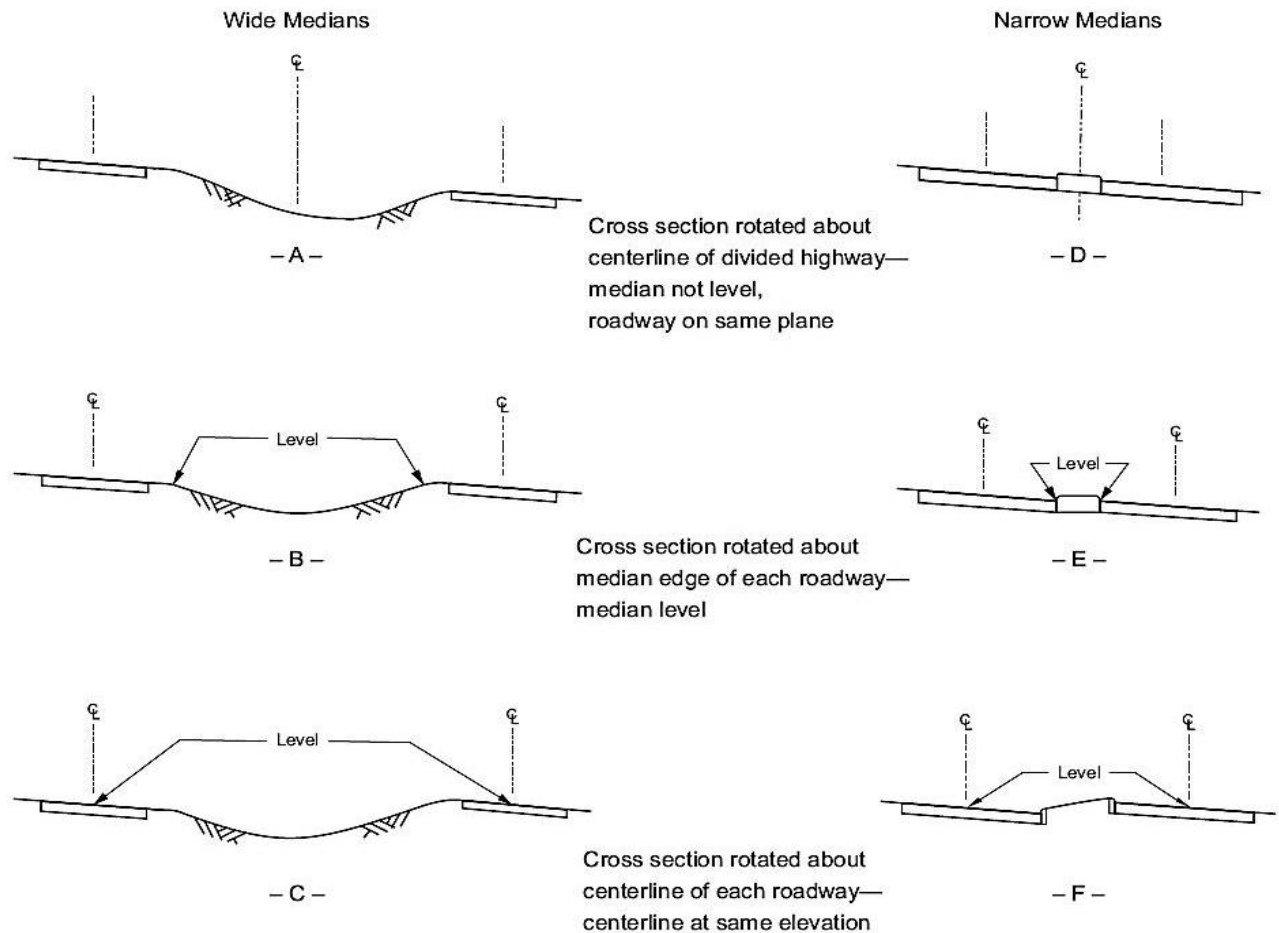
/2: Methods of Attaining Superelevation on Divided Arterials [1, p.7-18]
